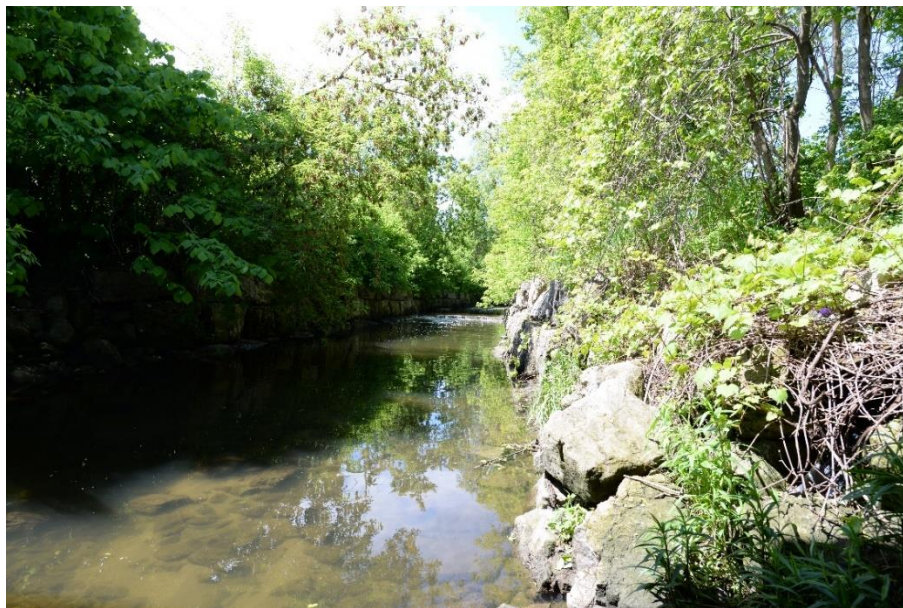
Looking upstream from underneath Dixie Road bridge. [taken June 2019]
